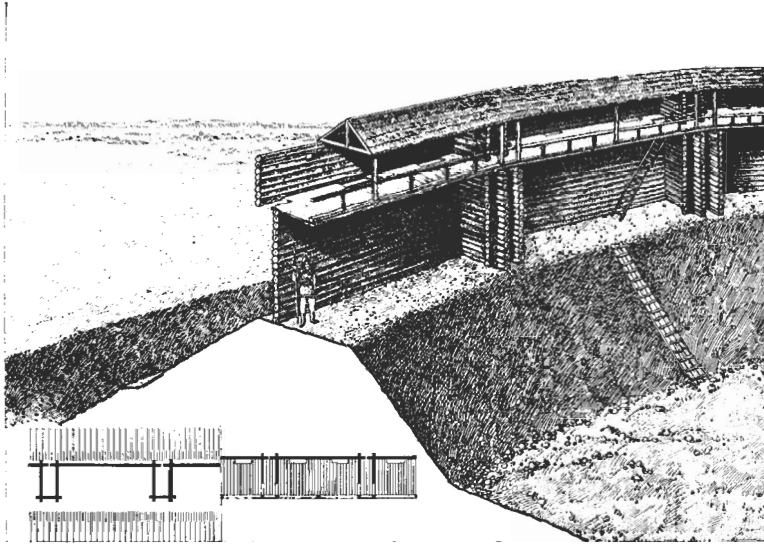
Defensive wall of an 11th-12th century Russian town. Reconstruction. (Phot. APN.)
